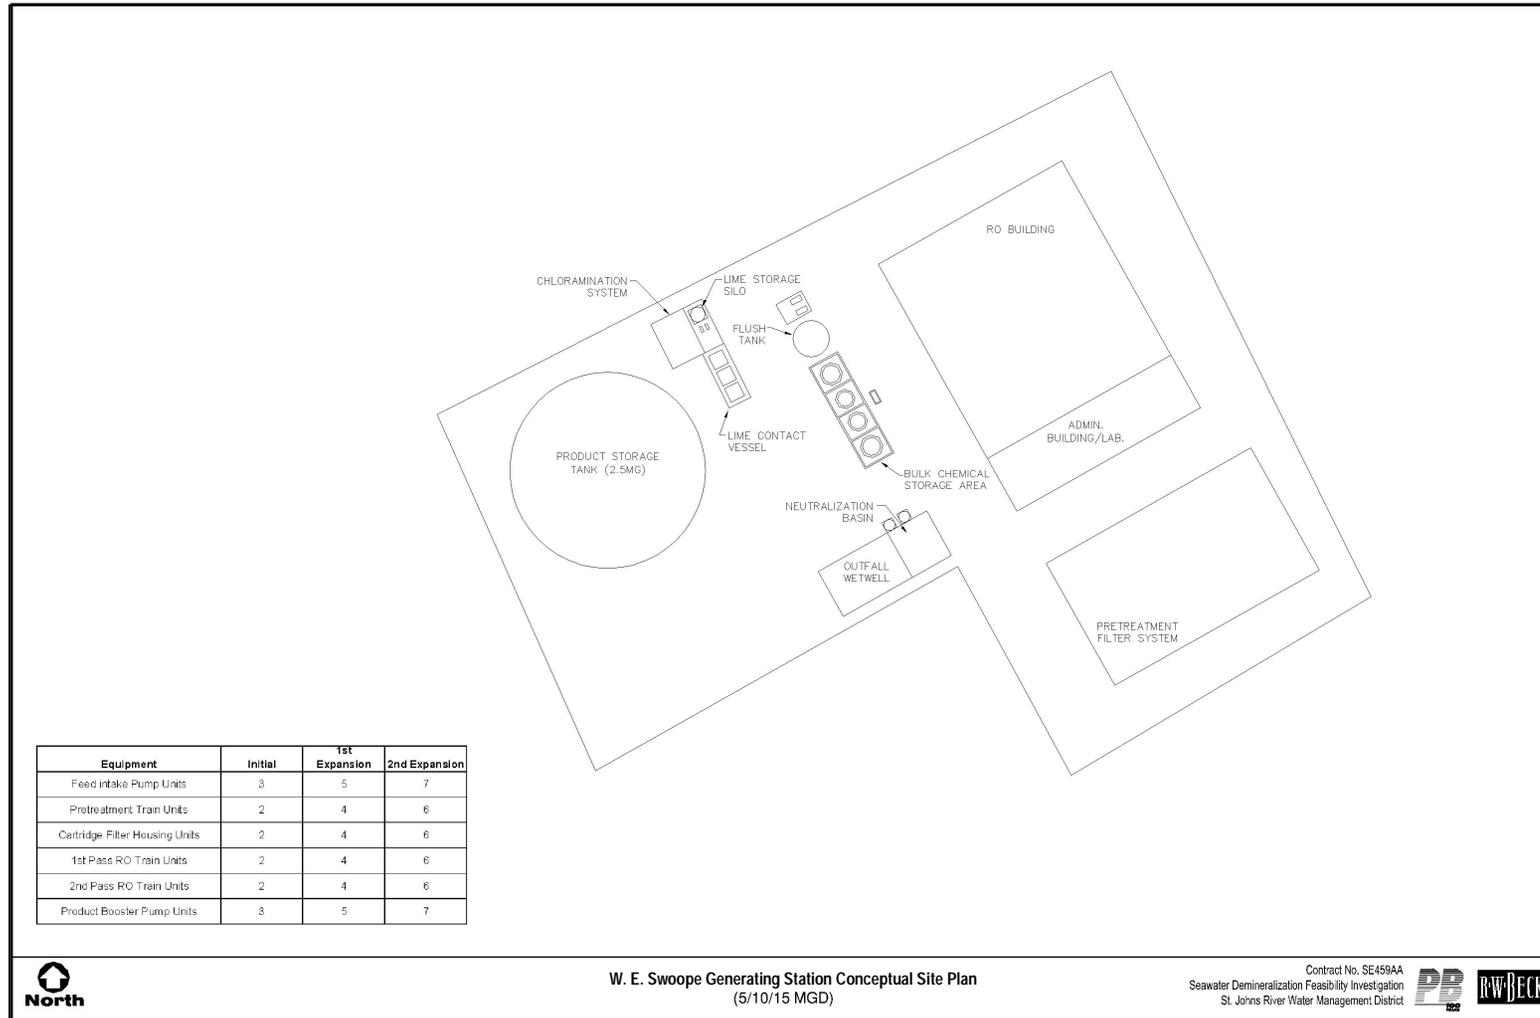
W. E. Swoope Generating Station Conceptual Site Plan
